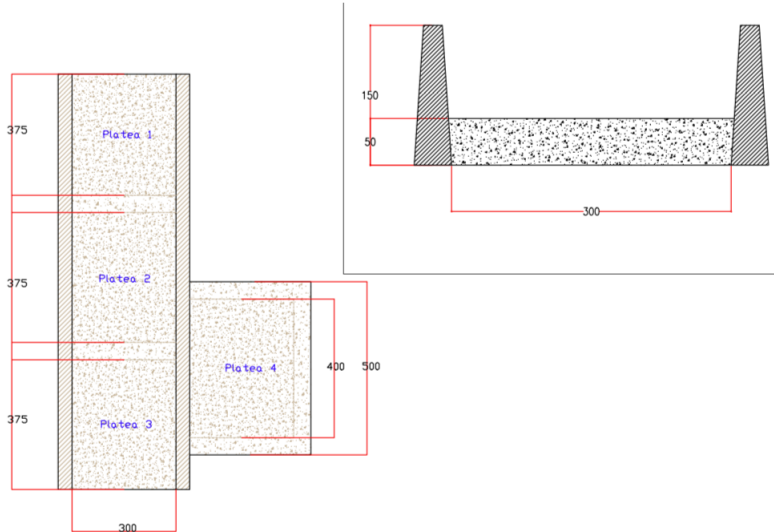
Waste slabs geometry; TSL slab 1, MBT slab 4
